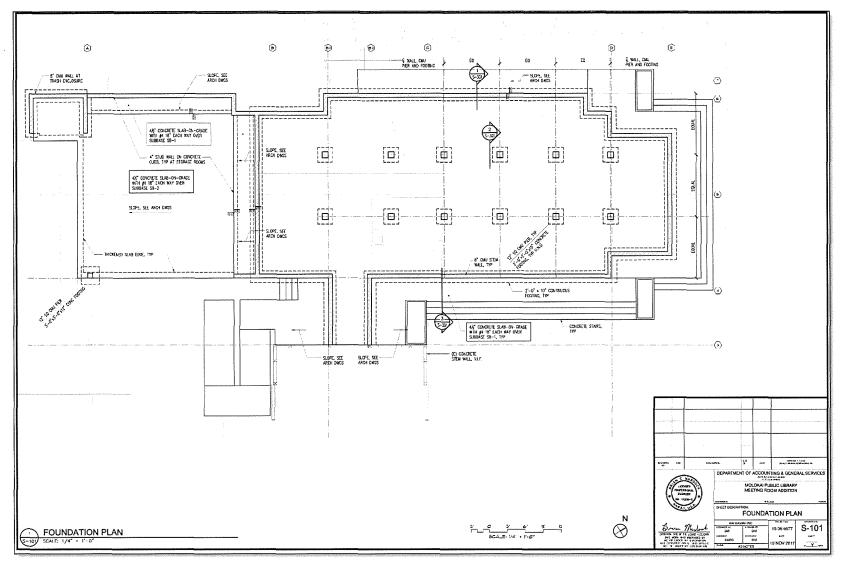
Foundation plan for the proposed meeting room addition showing the number of pier foundations and locations of the low CMU wall (plan courtesy of Fung Associates, Inc).
